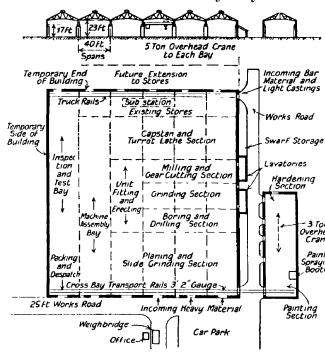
LIGHT AND MEDIUM MACHINE TOOLS FACTORY
